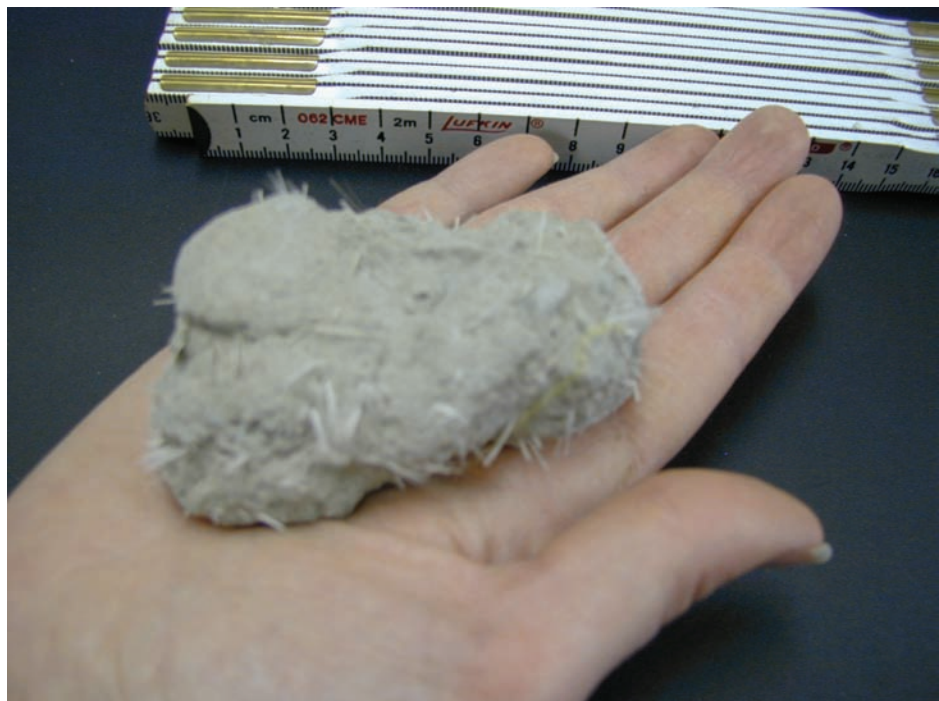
Fiber Reinforced Concrete (FRC)
